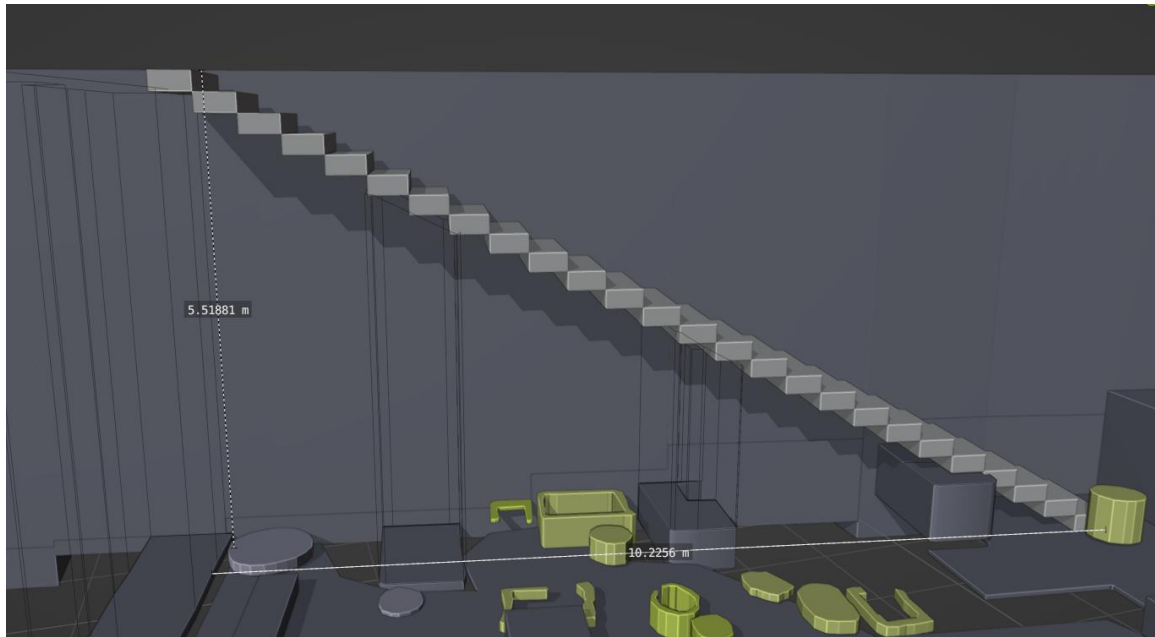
Hypothetical stairs supported by piers against the fortification wall in the south-western corner of the *Dunnu*. The spaces would have been bridged by timber beams, a manner of construction frequently seen in stairs construction.
